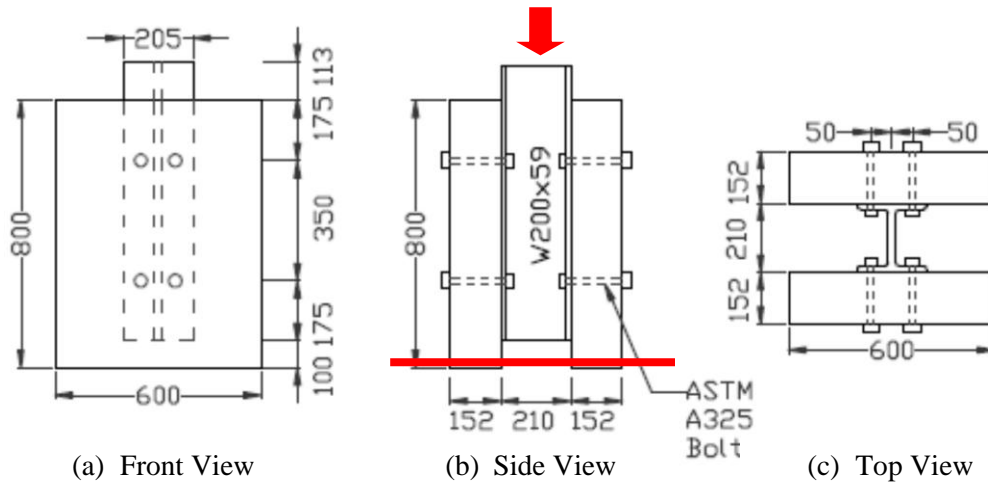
Push Test Specimen Geometry (dimensions in mm)
